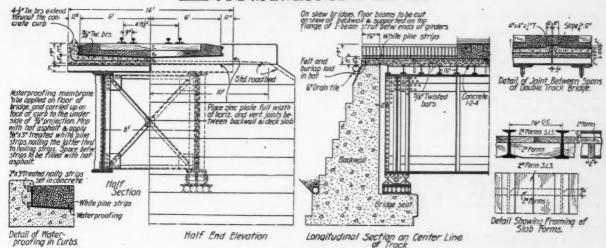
Type "D" Floor for Deck Girder Bridges, B. R. & P. Ry.
